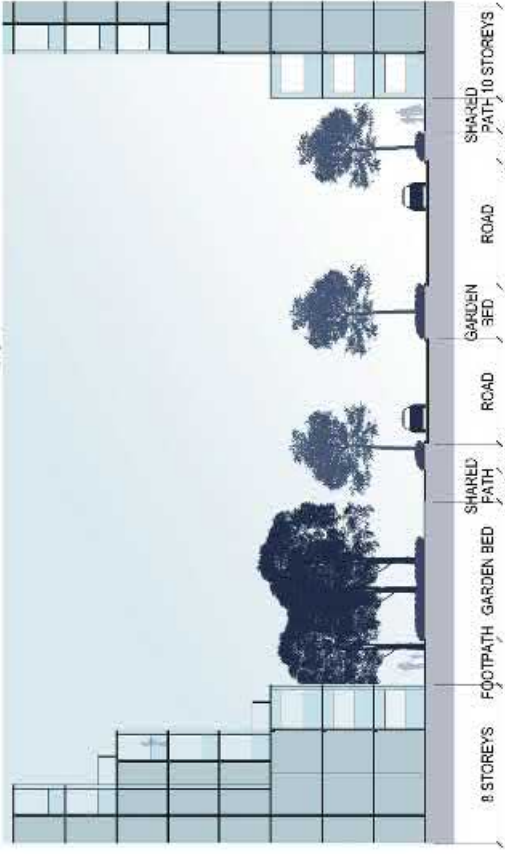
Resolution Drive Plan Extract and Indicative Cross-Section
